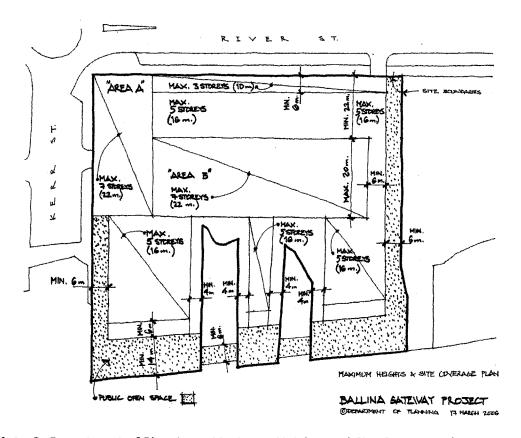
Department of Planning – Maximum Heights and Site Coverage Plan.
